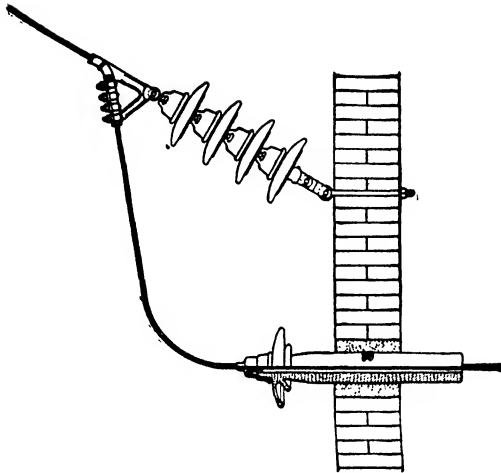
Typical wall entrance for high voltage. (Ohio Brass Company.)
